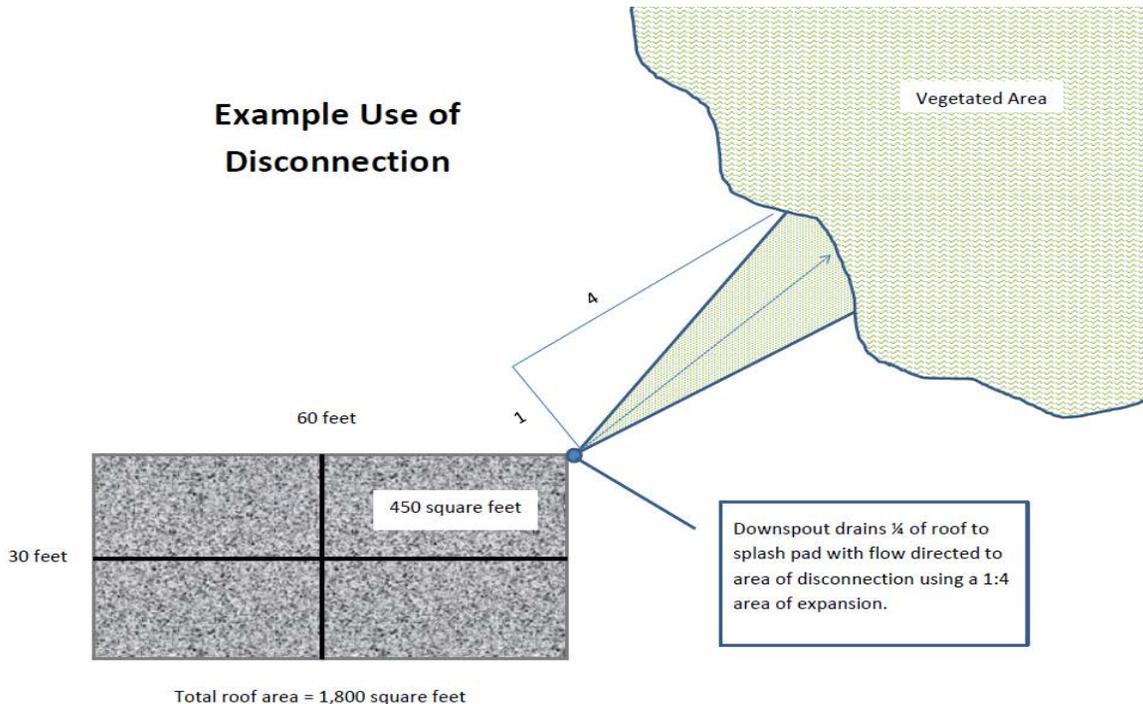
Treating a rooftop with disconnection, adapted from “Rhode Stormwater Management Guidance for Individual Single-Family Residential Lot Development” (RIDEM, 2013)
